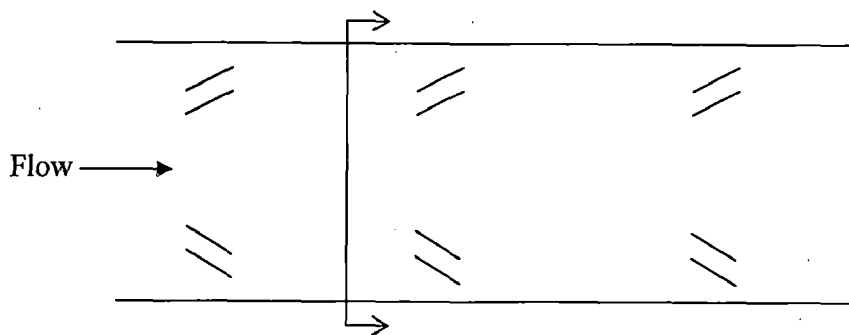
Typical layout of Submerged vane for maintaining navigation depth
